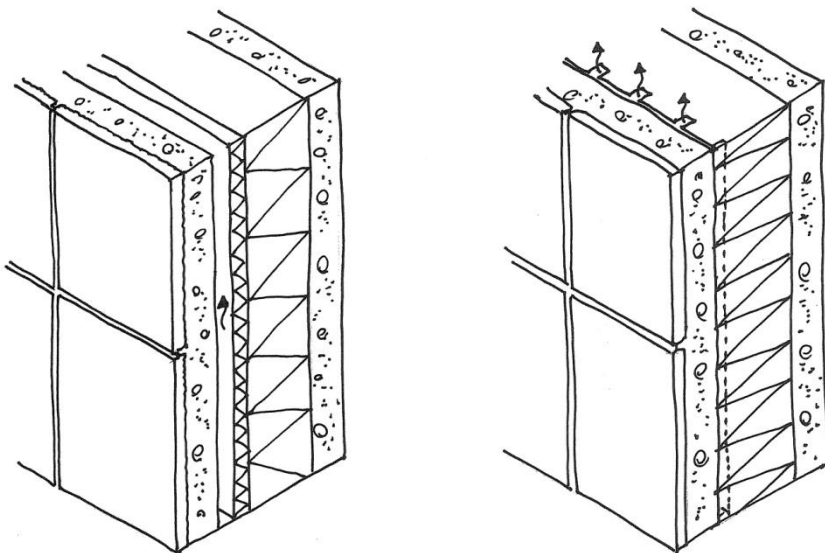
Stone tiles in the ventilated concrete shell element on the left and stone tiles in the ventilated sandwich element on the right
